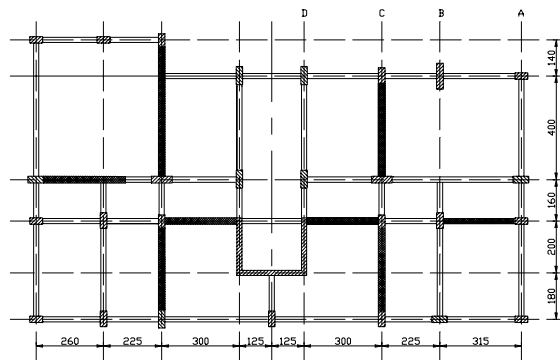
Strengthening scheme applied to the building (Darker shadings show newly added R/C walls)
